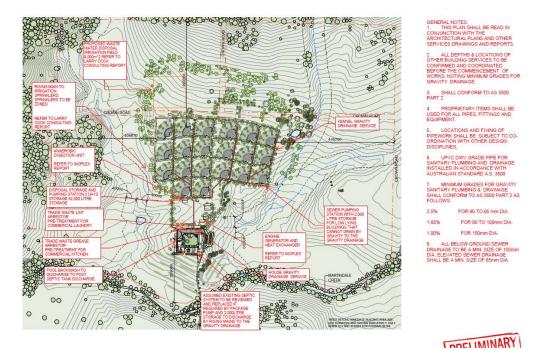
(Preliminary Drainage Service Plan, Warren Smith Consulting Utility Report)
